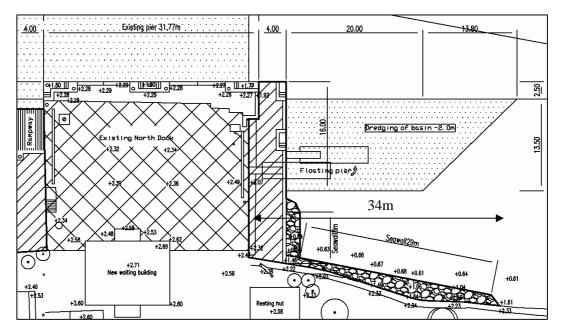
(2)-10 Layout Plan of Eastern Revetment
